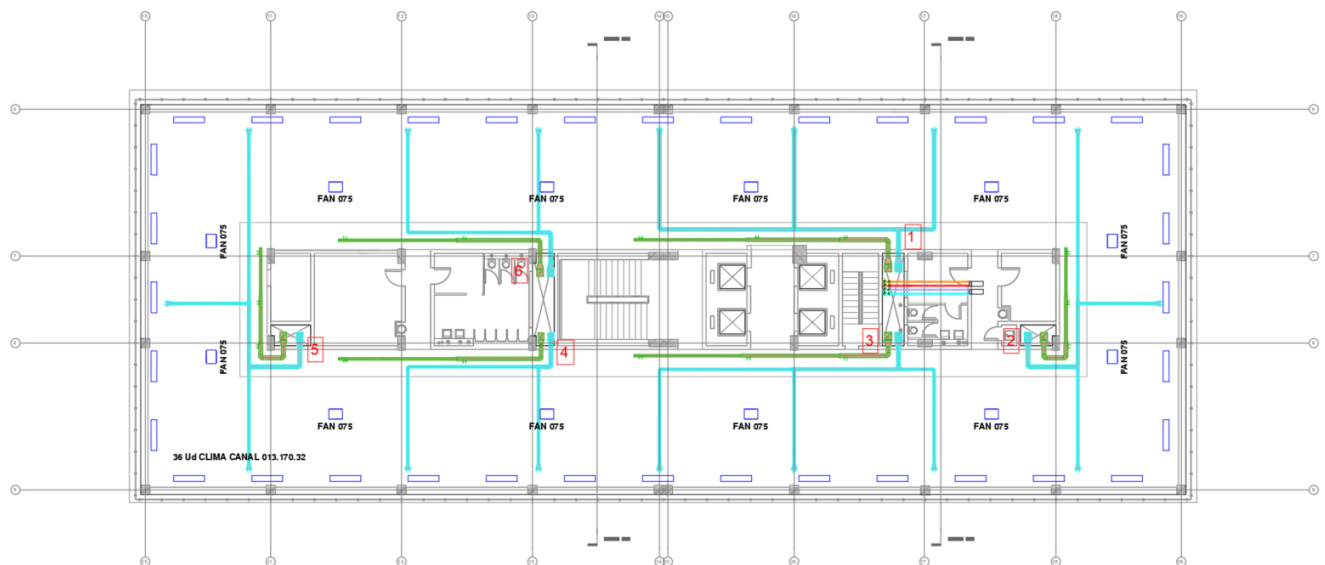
Plan view of standard plan, alternative 2 (source: AIGUASOL).
